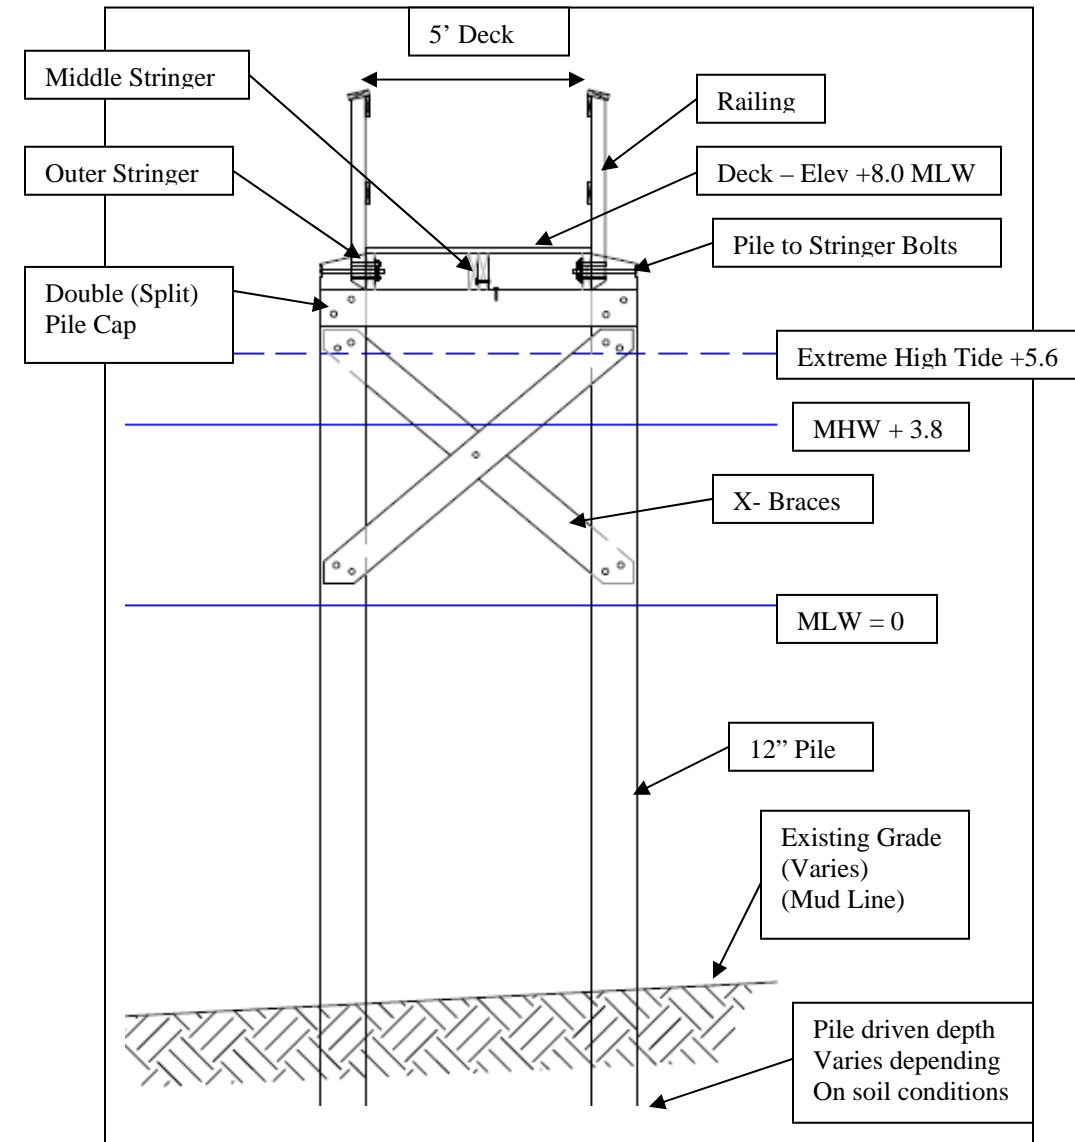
Typical Pier Section – without wave break. Span between bents = 14.0'
